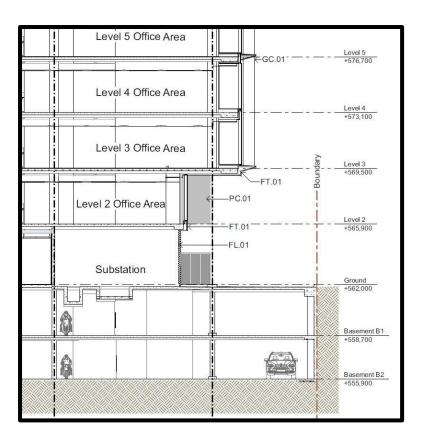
Section through building near waste enclosure detailing operation height (source: Willemsen 2022)
